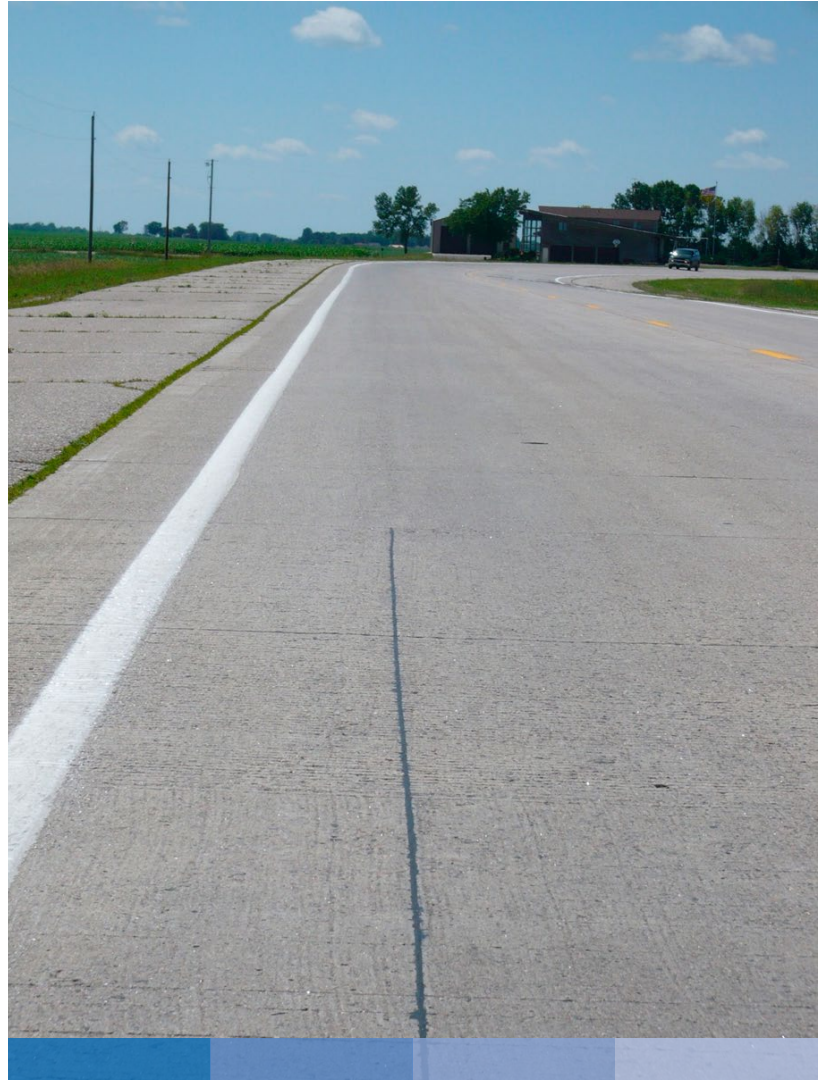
COC-U with widening, with and without tied longitudinal joint over old pavement edge on TH 212, Minnesota, USA. Photo: Matt Zeller, Concrete Paving Association of Minnesota.
